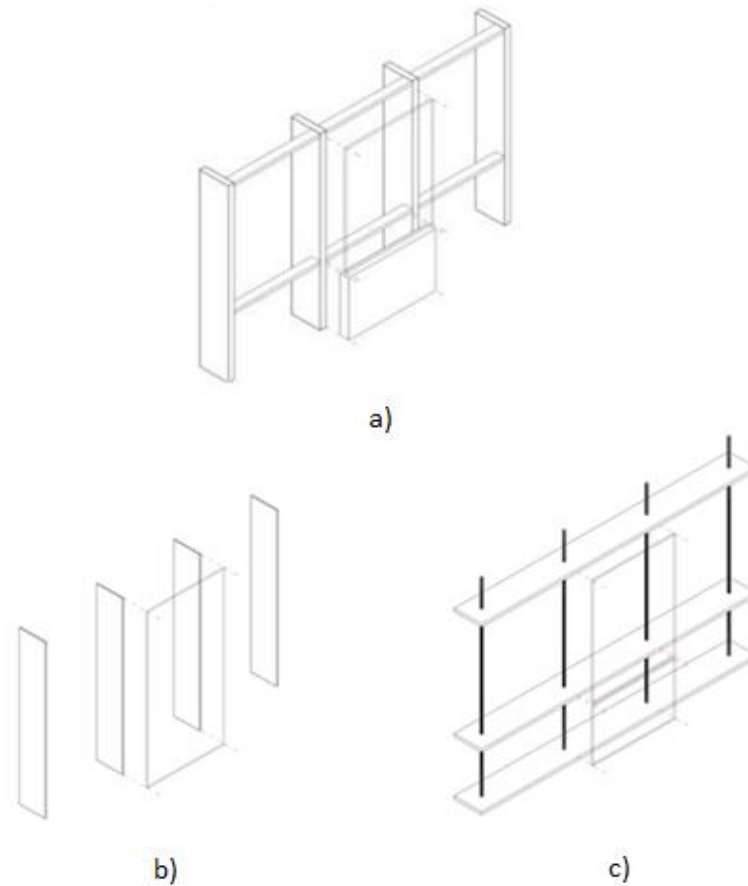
Possible façade configurations stick system: a) post-and-beam, b) post, c) beam (Knaack et al., 2014)
